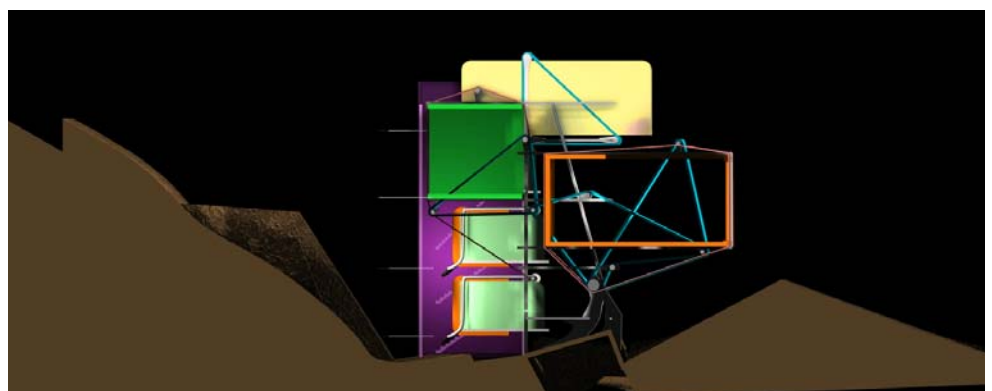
Digital Cross-Section of Entire Building on Site, by Sergio Ramirez
